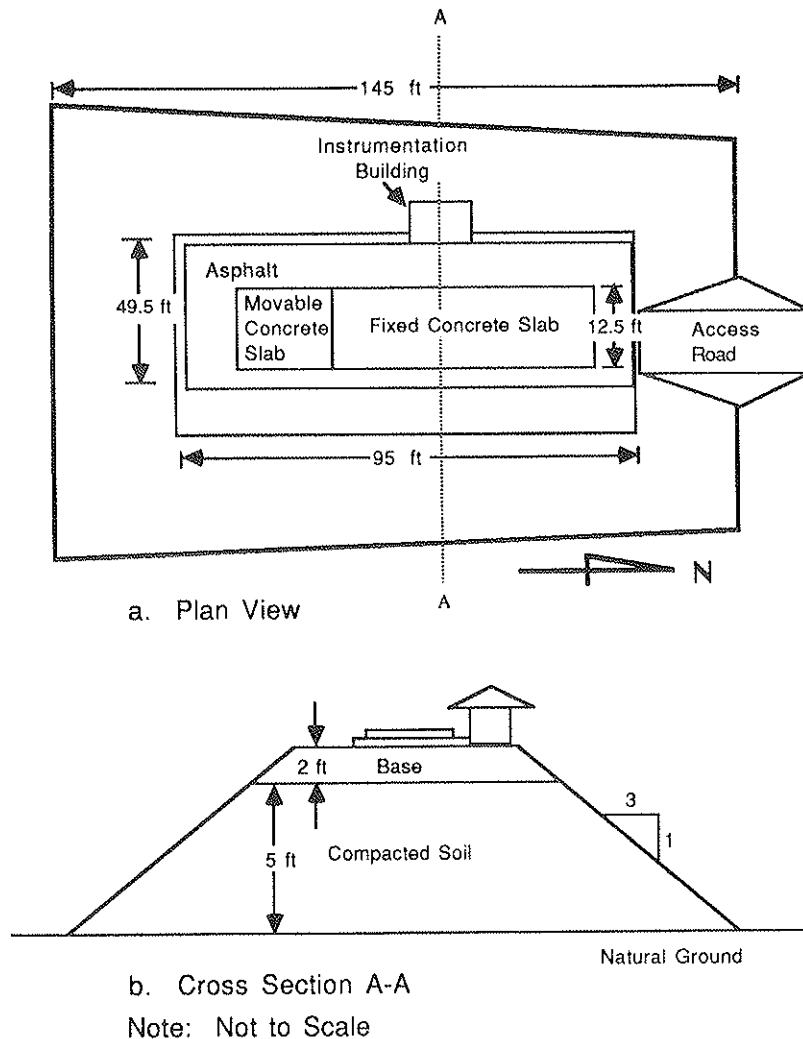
Plan and cross-sectional views of BRC pavement facility.
